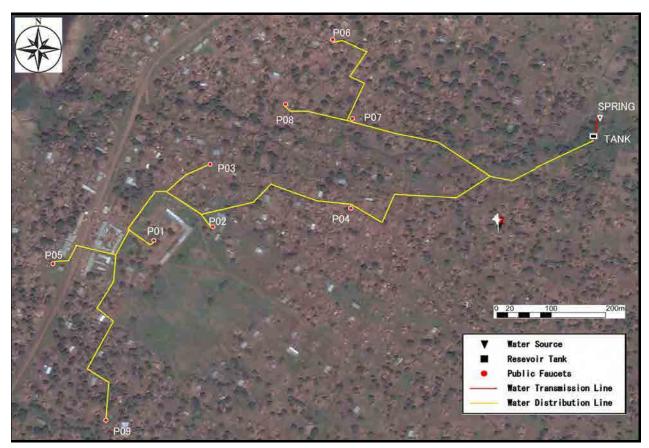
Facilities Layout Plan for Kabuta in Nchelenge District
